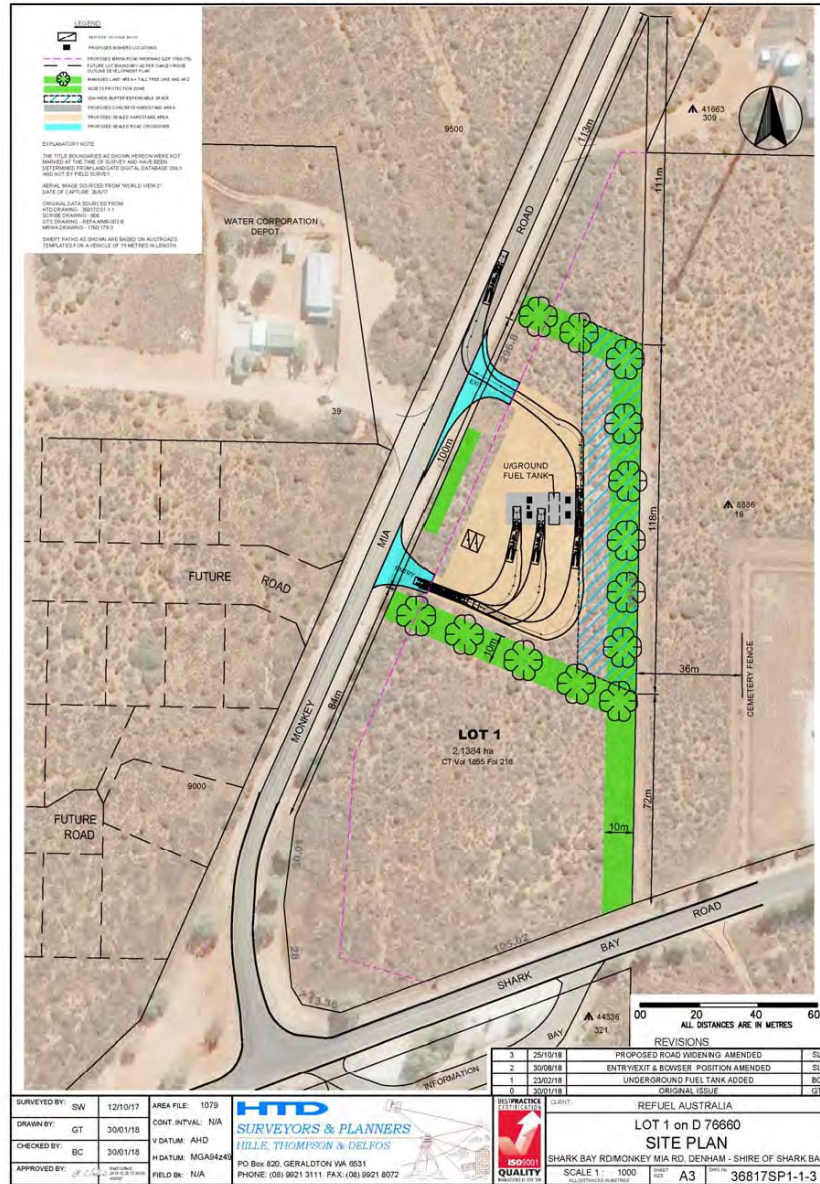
Site Plan for Outside Payment Terminal (OPT) facility on Lot 1
